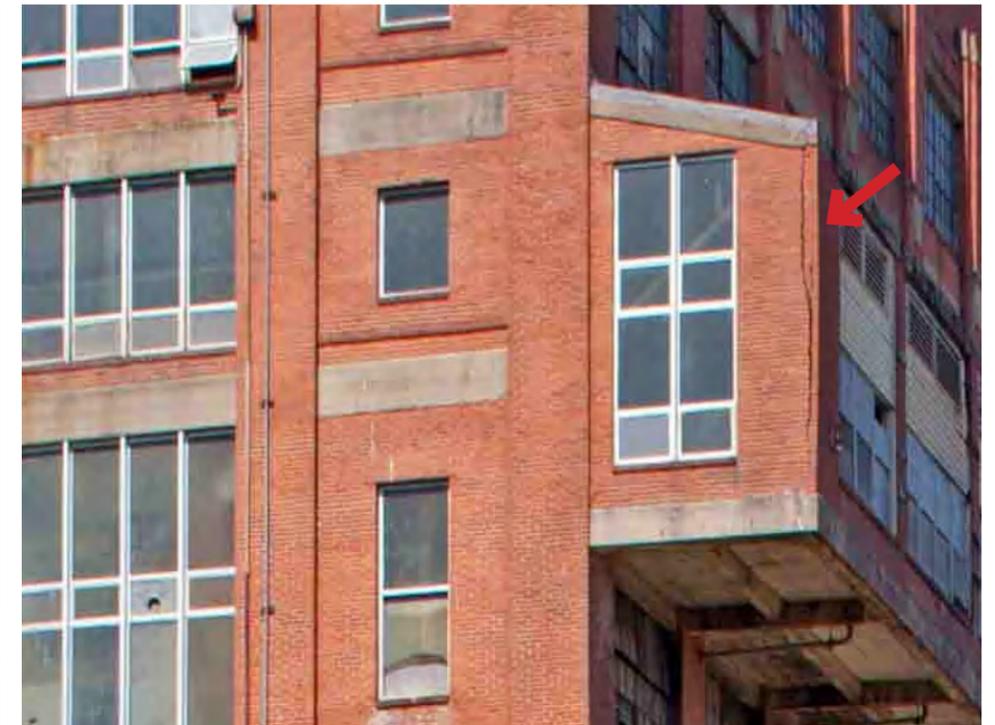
CRACK AT BUILDING CORNER ON CANTILEVER
